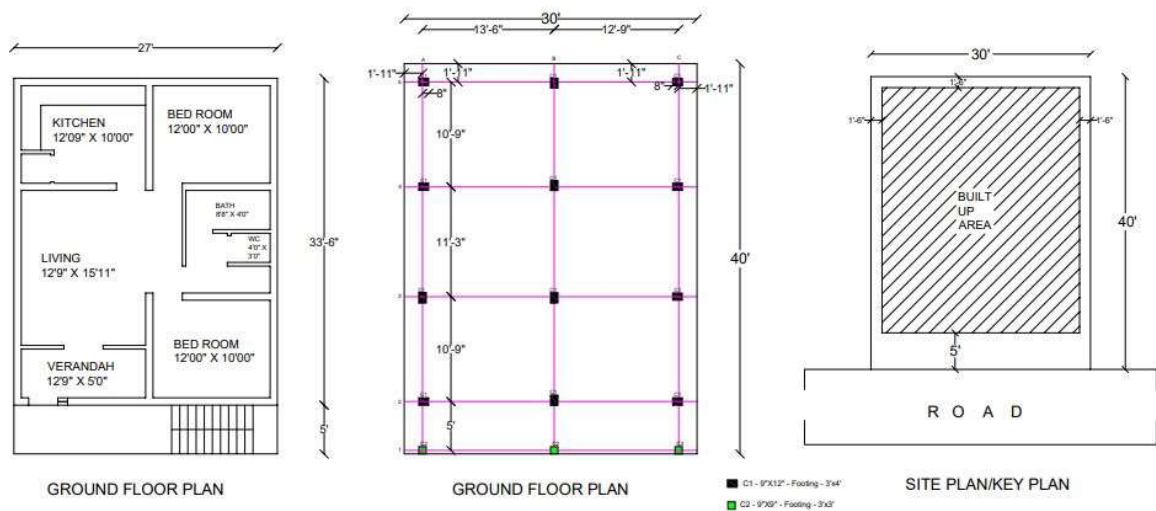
PLAN FOF CONSTRUCTION OF RESIDENTIAL BUILDING
